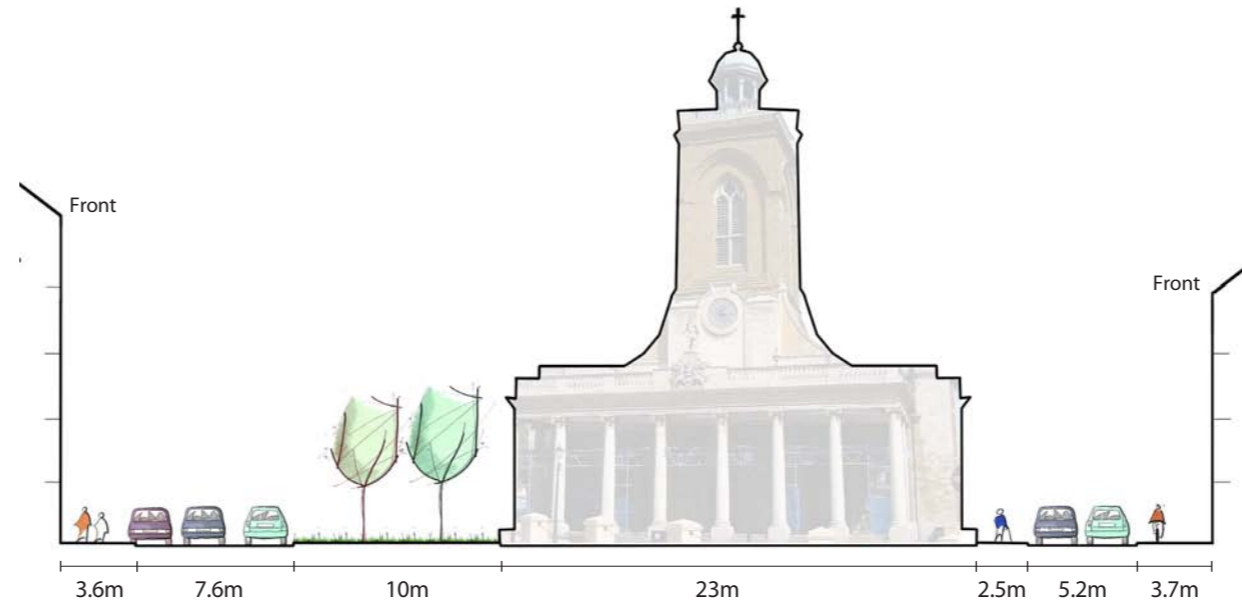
Section C cuts looking onto All Saints Church, demonstrating the civic nature of the space
